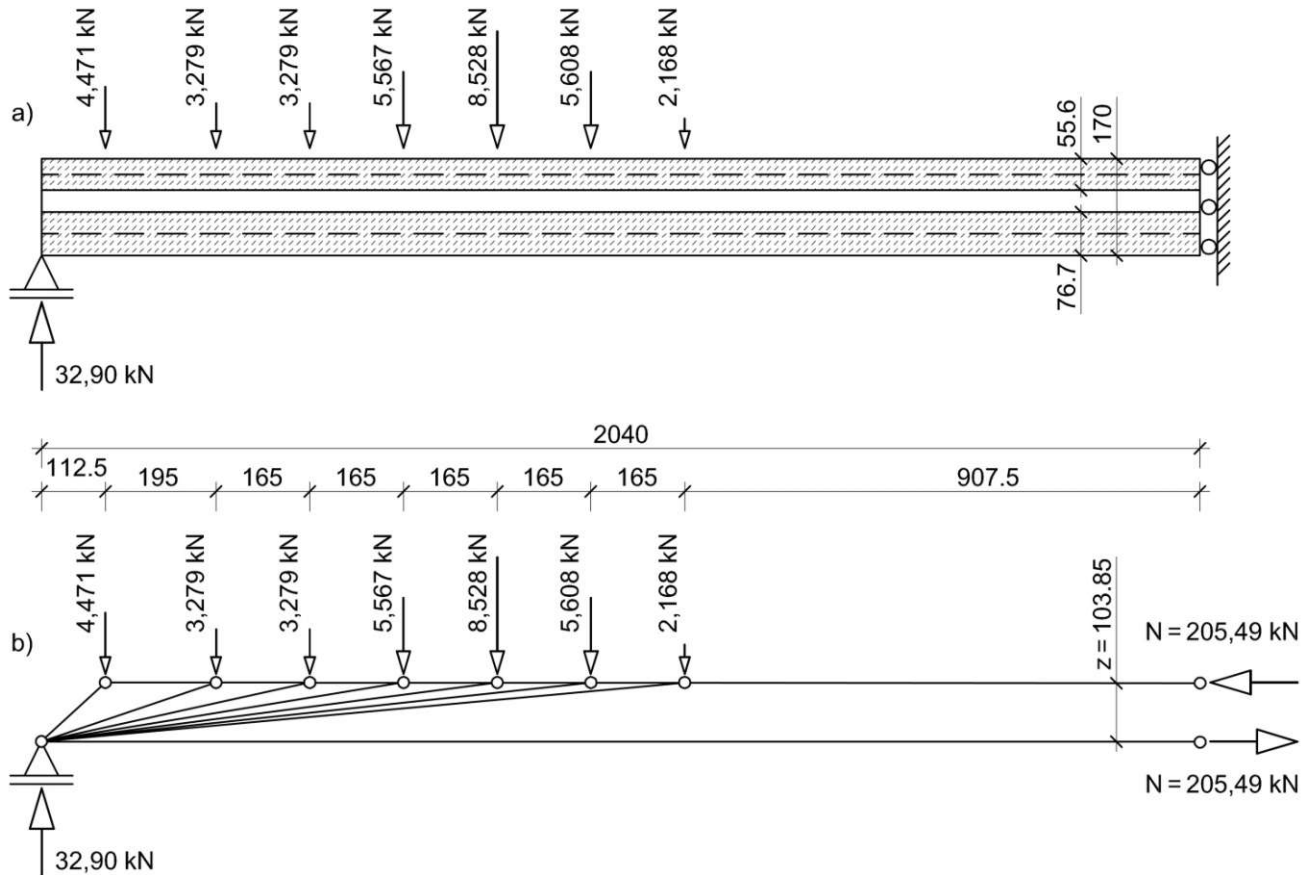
Model design for concrete: a) the horizontal truss members with the external loading; b) the truss frame model
